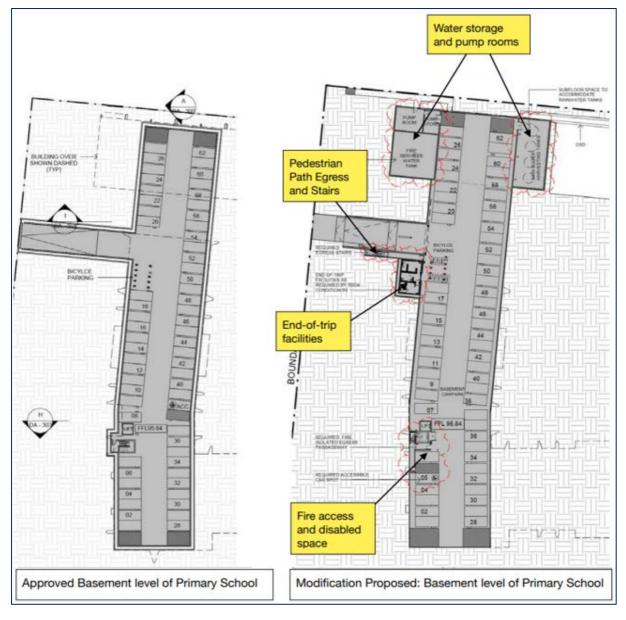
| Proposed modifications at basement level (Source: Applicant's Modification Report)
